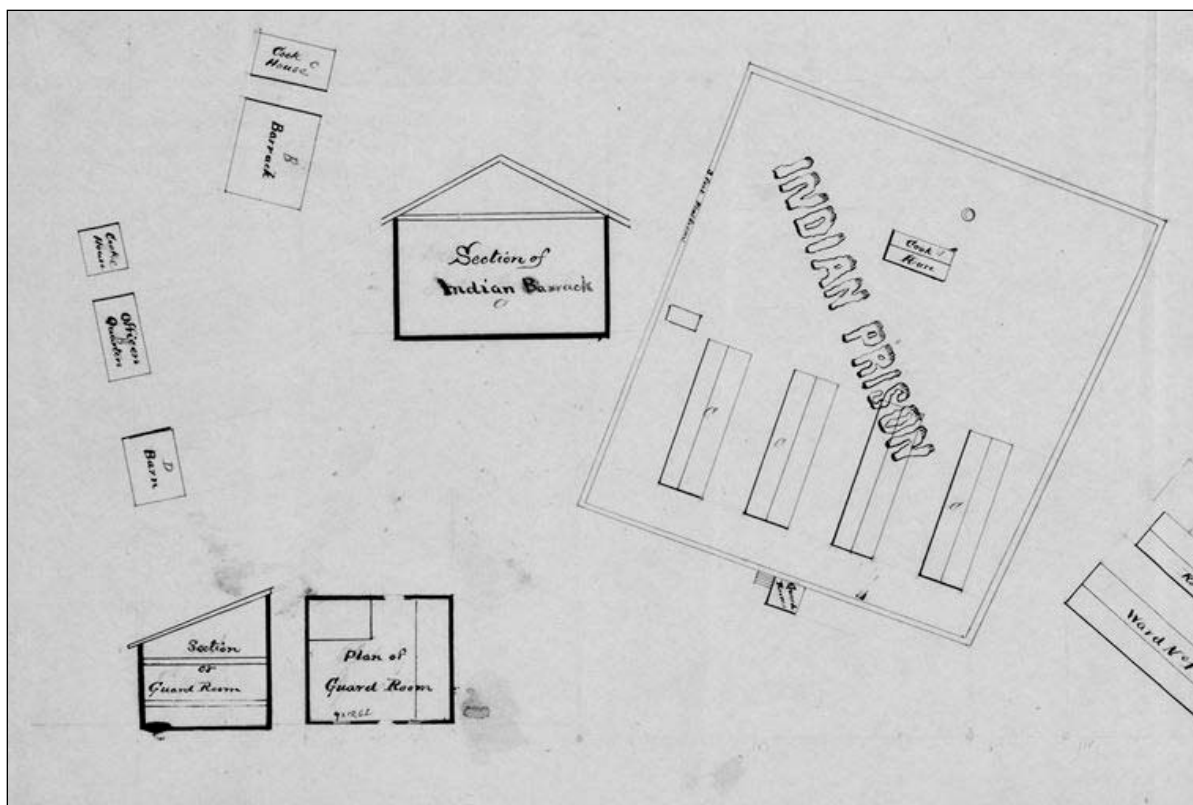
Detail, map of Camp Kearney plan with sectional views of and guard room plan
